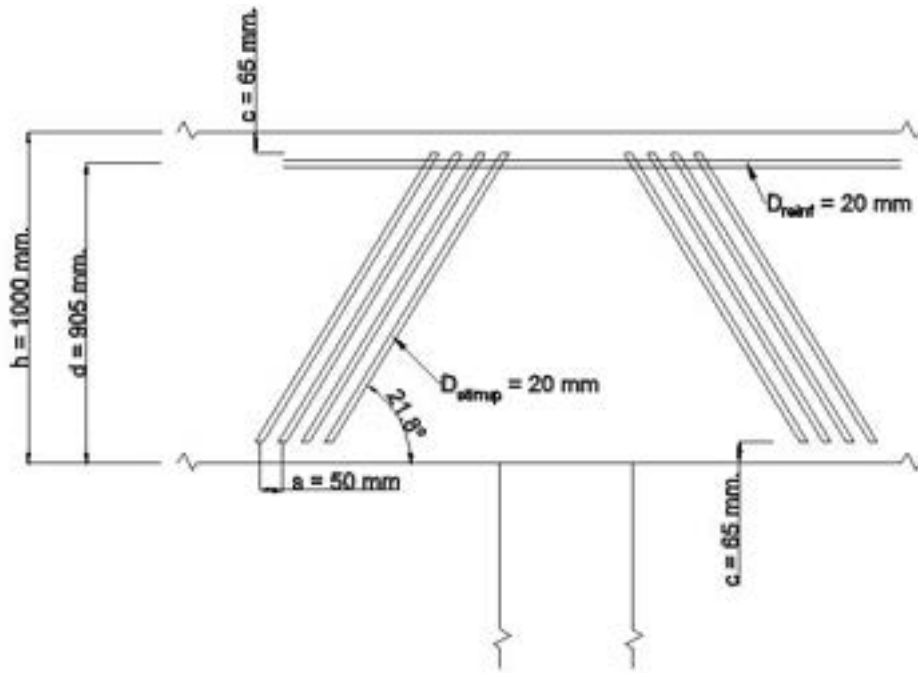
Reinforcement needed to resist the design shear force. Horizontal cut of the water-retaining wall. Notice that the angle is not represented with its actual tilting to better fit the bars.
